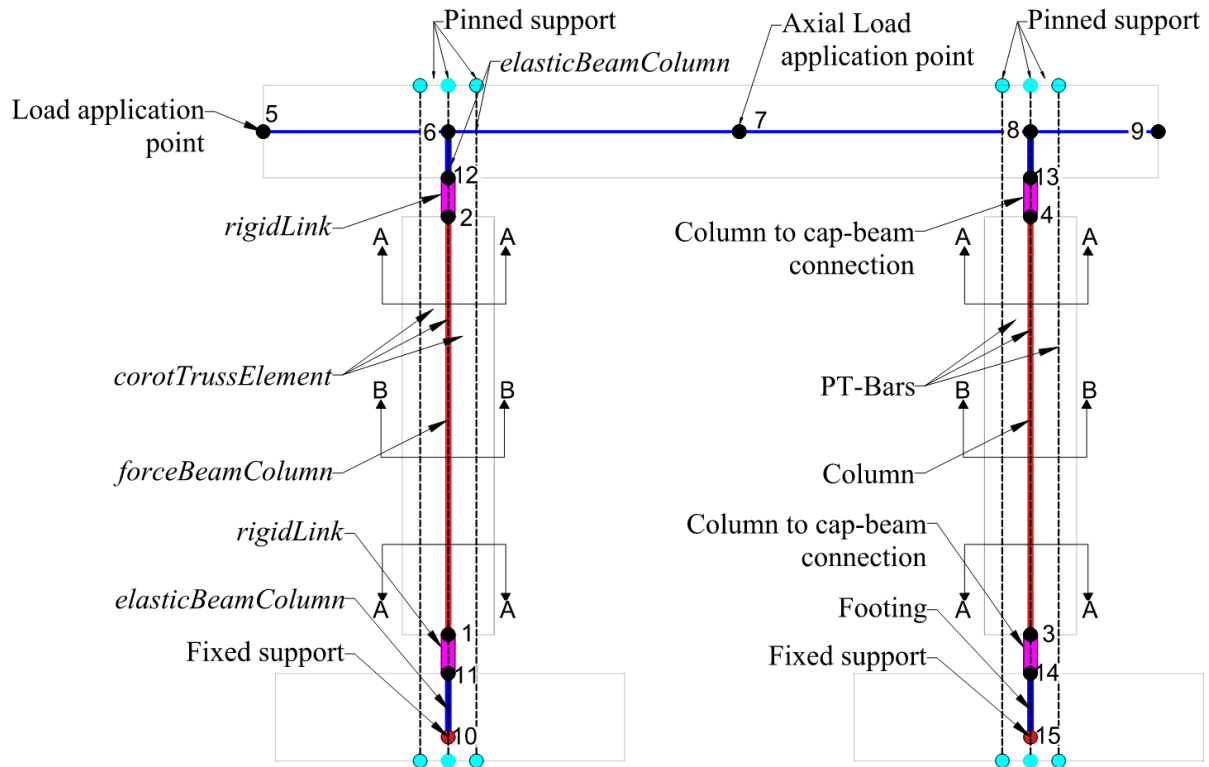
Prototype bridge bent of Riverdale Bridge with details
